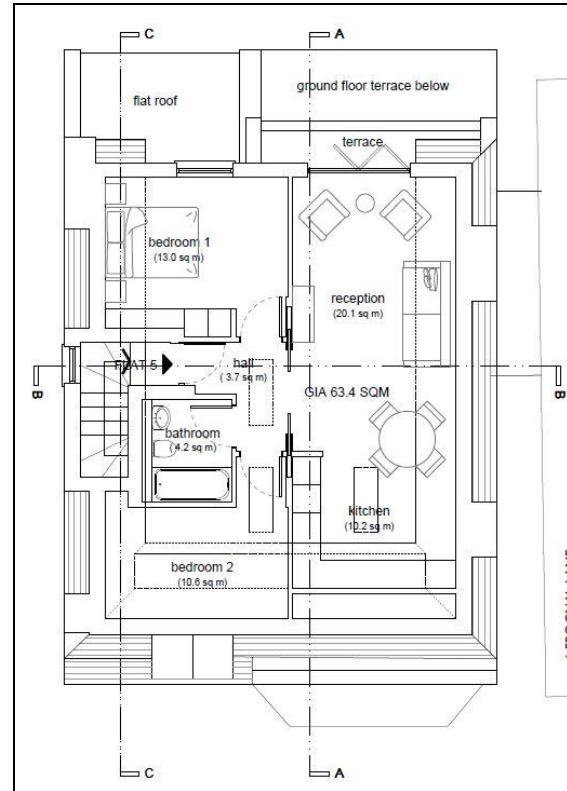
Extract from drawing 7395/ 114 Proposed third floor Plan
